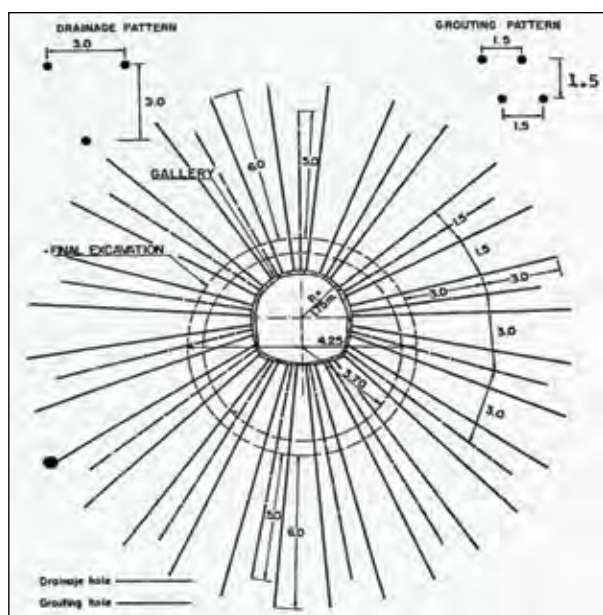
Pattern for the radial grouting and drainage for enlargement of the pilot tunnel of the Guavio tailrace tunnel.
